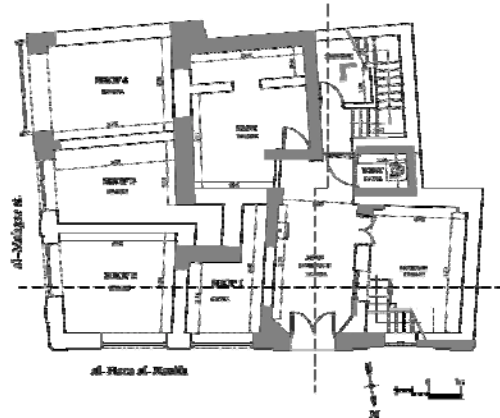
Ground Floor Plan showing replaced walls in dark.
